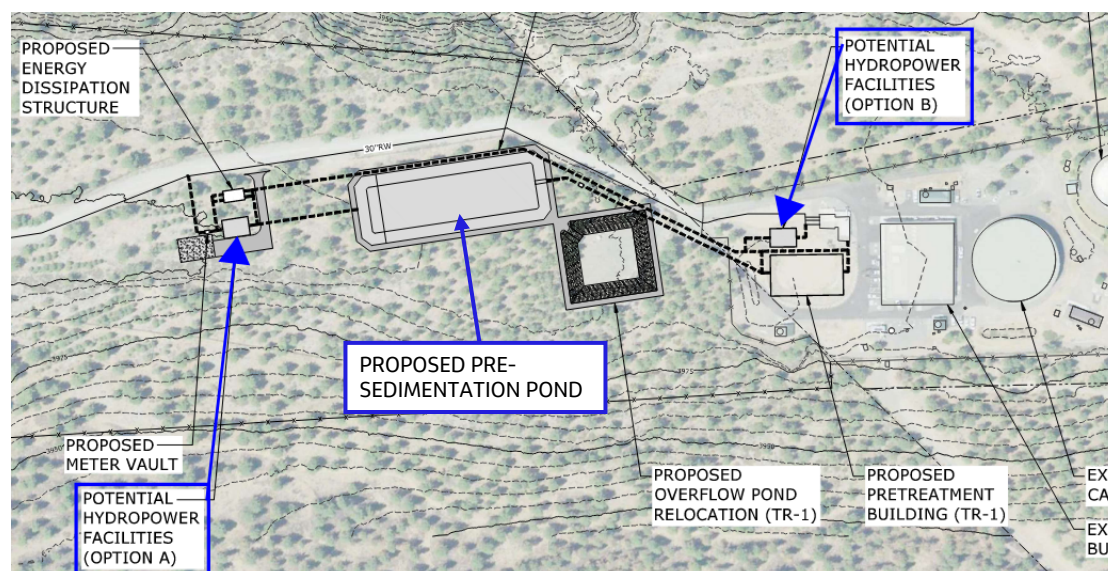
Two Proposed Potential Locations of Hydropower Facilities, Options A and B
